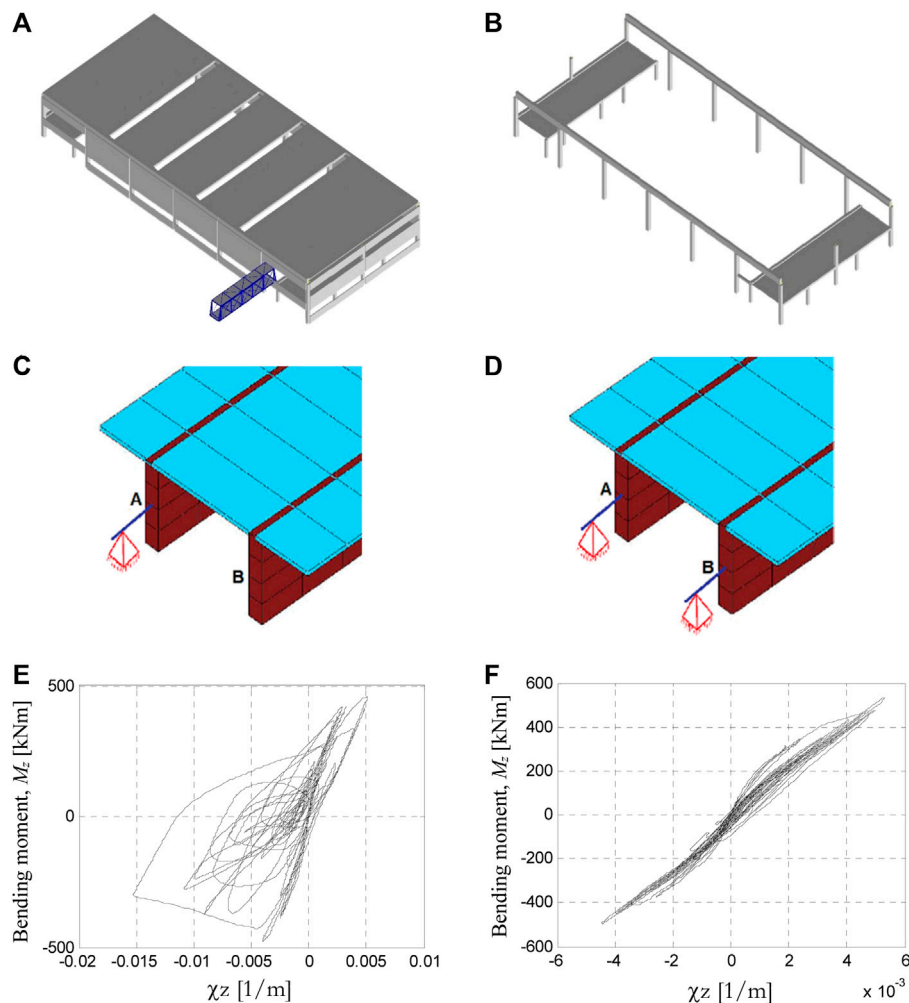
| FE model of a precast building located in the Scientific-Technological campus of the University of Ferrara: global model (A) showing and (B) hiding roof elements and cladding panels; end support of a Pi-shaped roof element with connections to the main beams applied to (C) one single web or (D) both webs. Moment-curvature cyclic diagram at the base of one of the columns obtained from NRH analysis (E) before and (F) after retrofitting.
